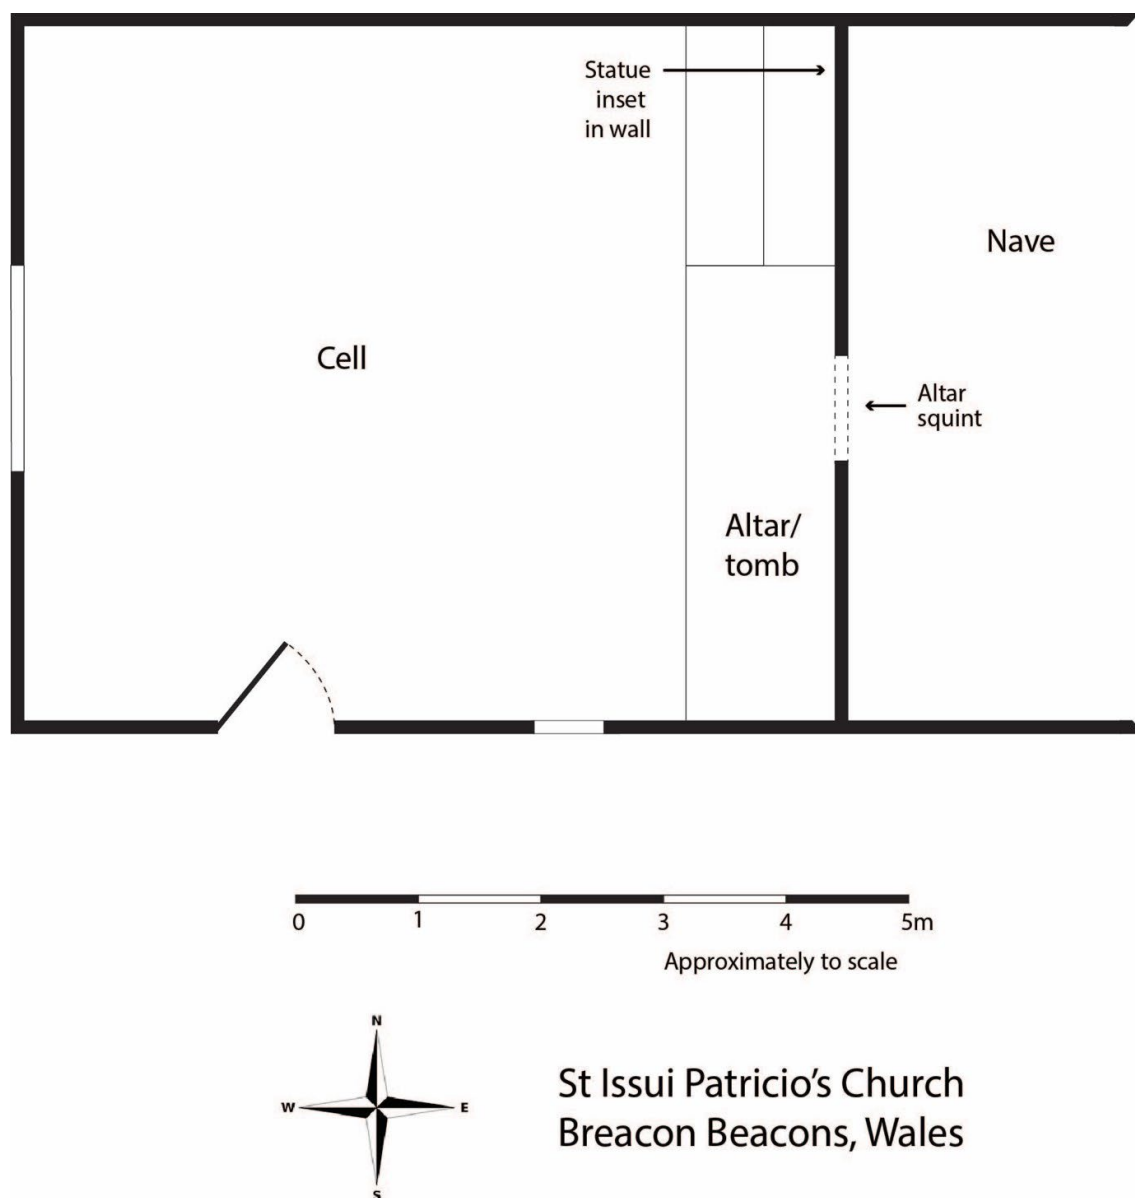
Floor plan of the anchorite cell at St. Issui Patricio's Church.
